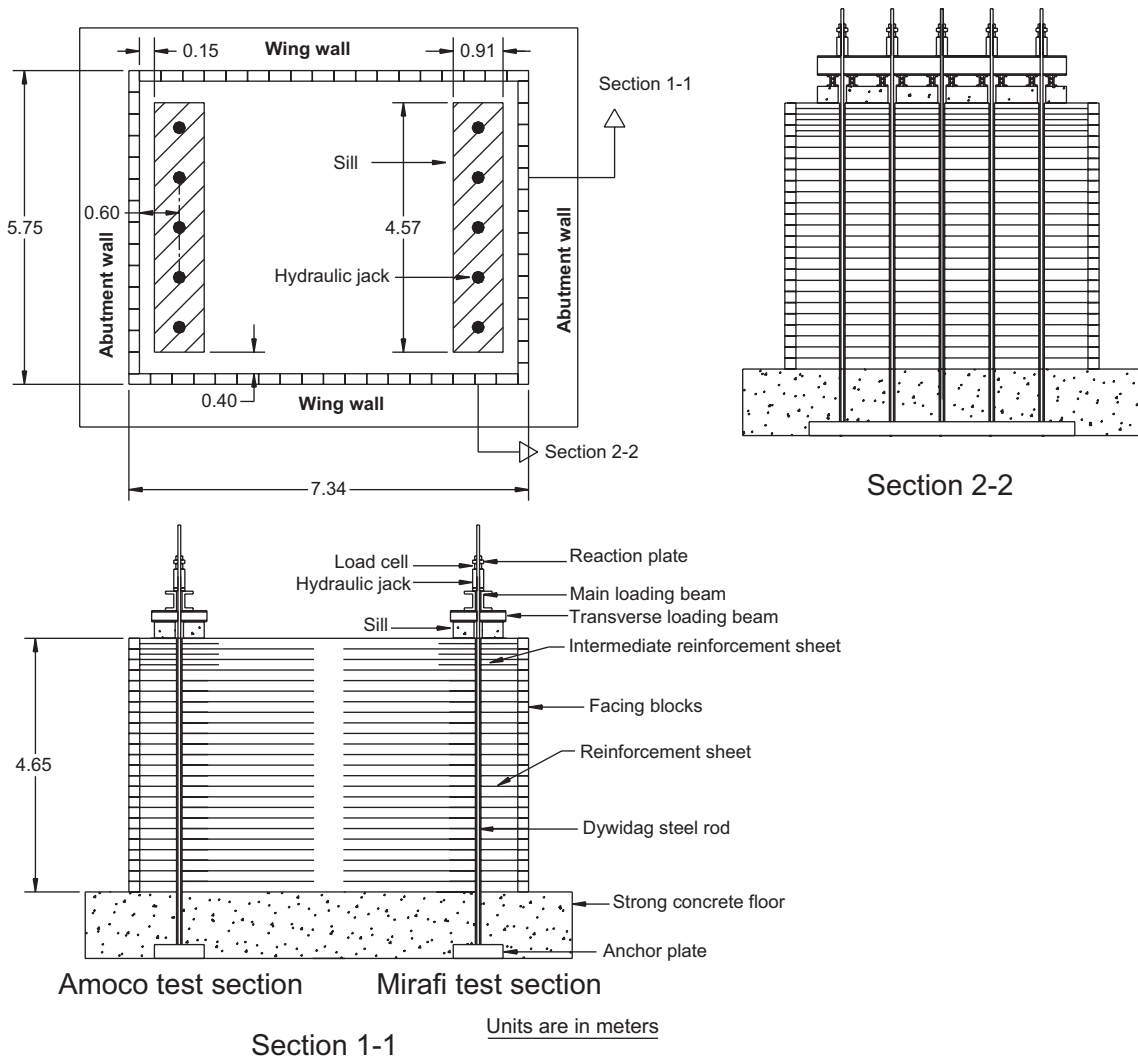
Configuration of the NCHRP full-scale test abutments.
